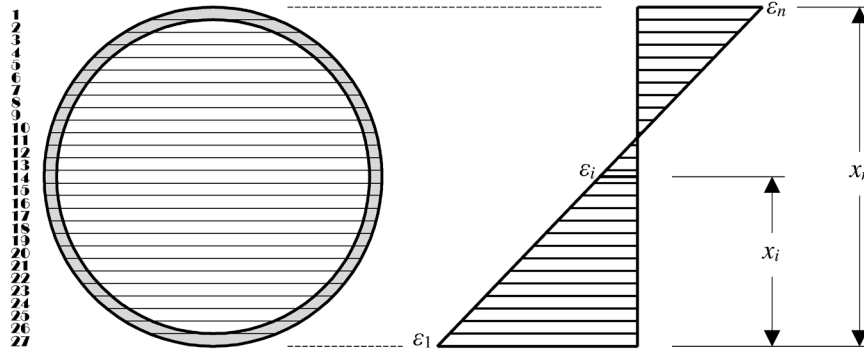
Dividing the concrete-filled tubular element into plots.
